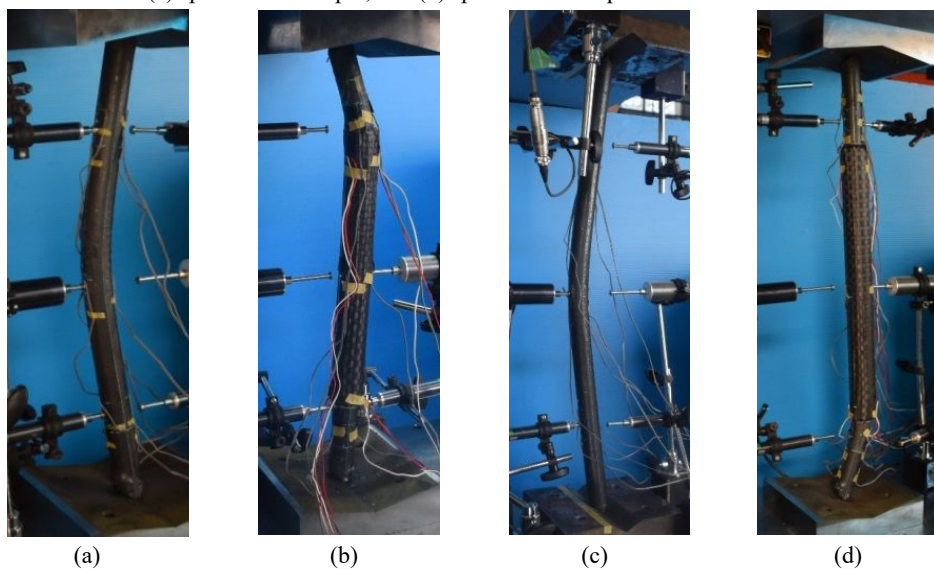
Failure modes: (a) specimen 560-NS, (b) specimen 560-340, (c) specimen 760-NS, and (d) specimen 760-460.
